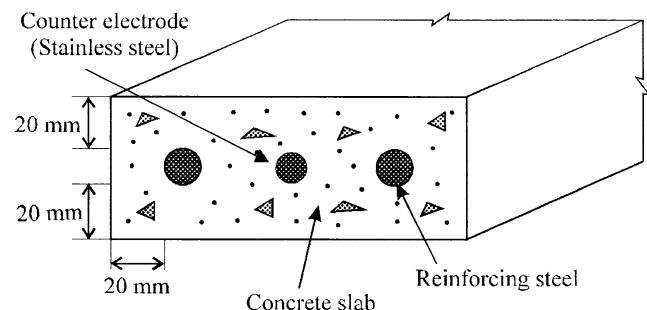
Sketch of the concrete slab containing U-shaped rebar.
